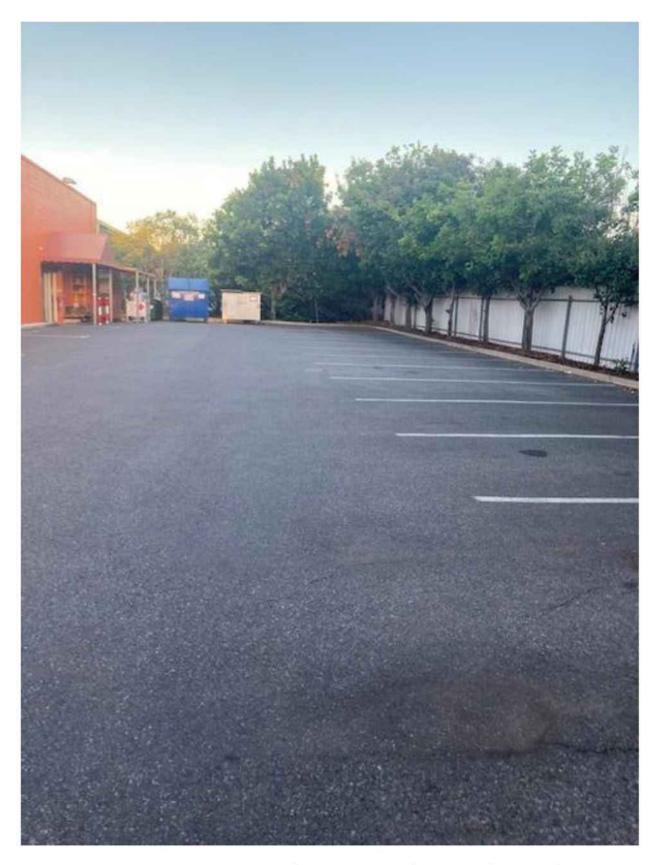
Existing carpark at No. 1 Farnham Road Keswick
